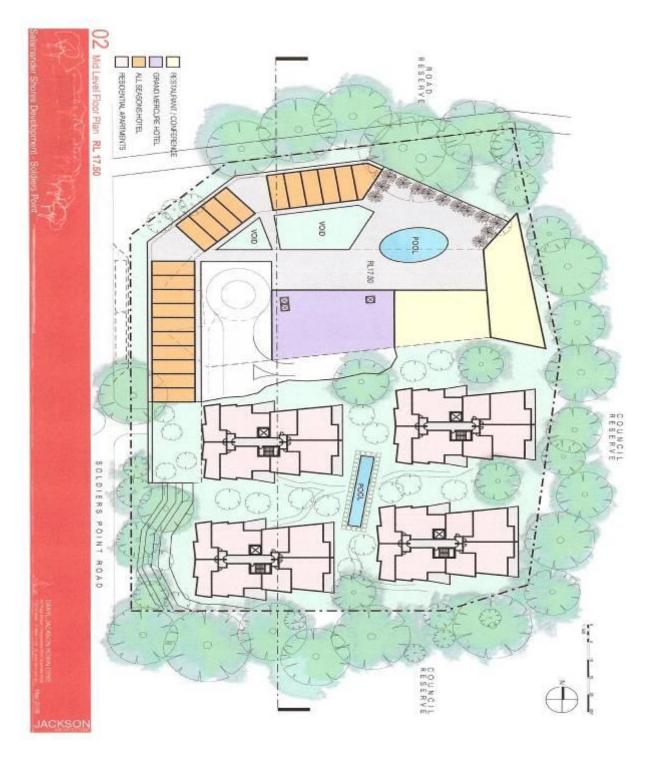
Proposed Development Mid Level Floor Plan (Source: SAKE Developments)
